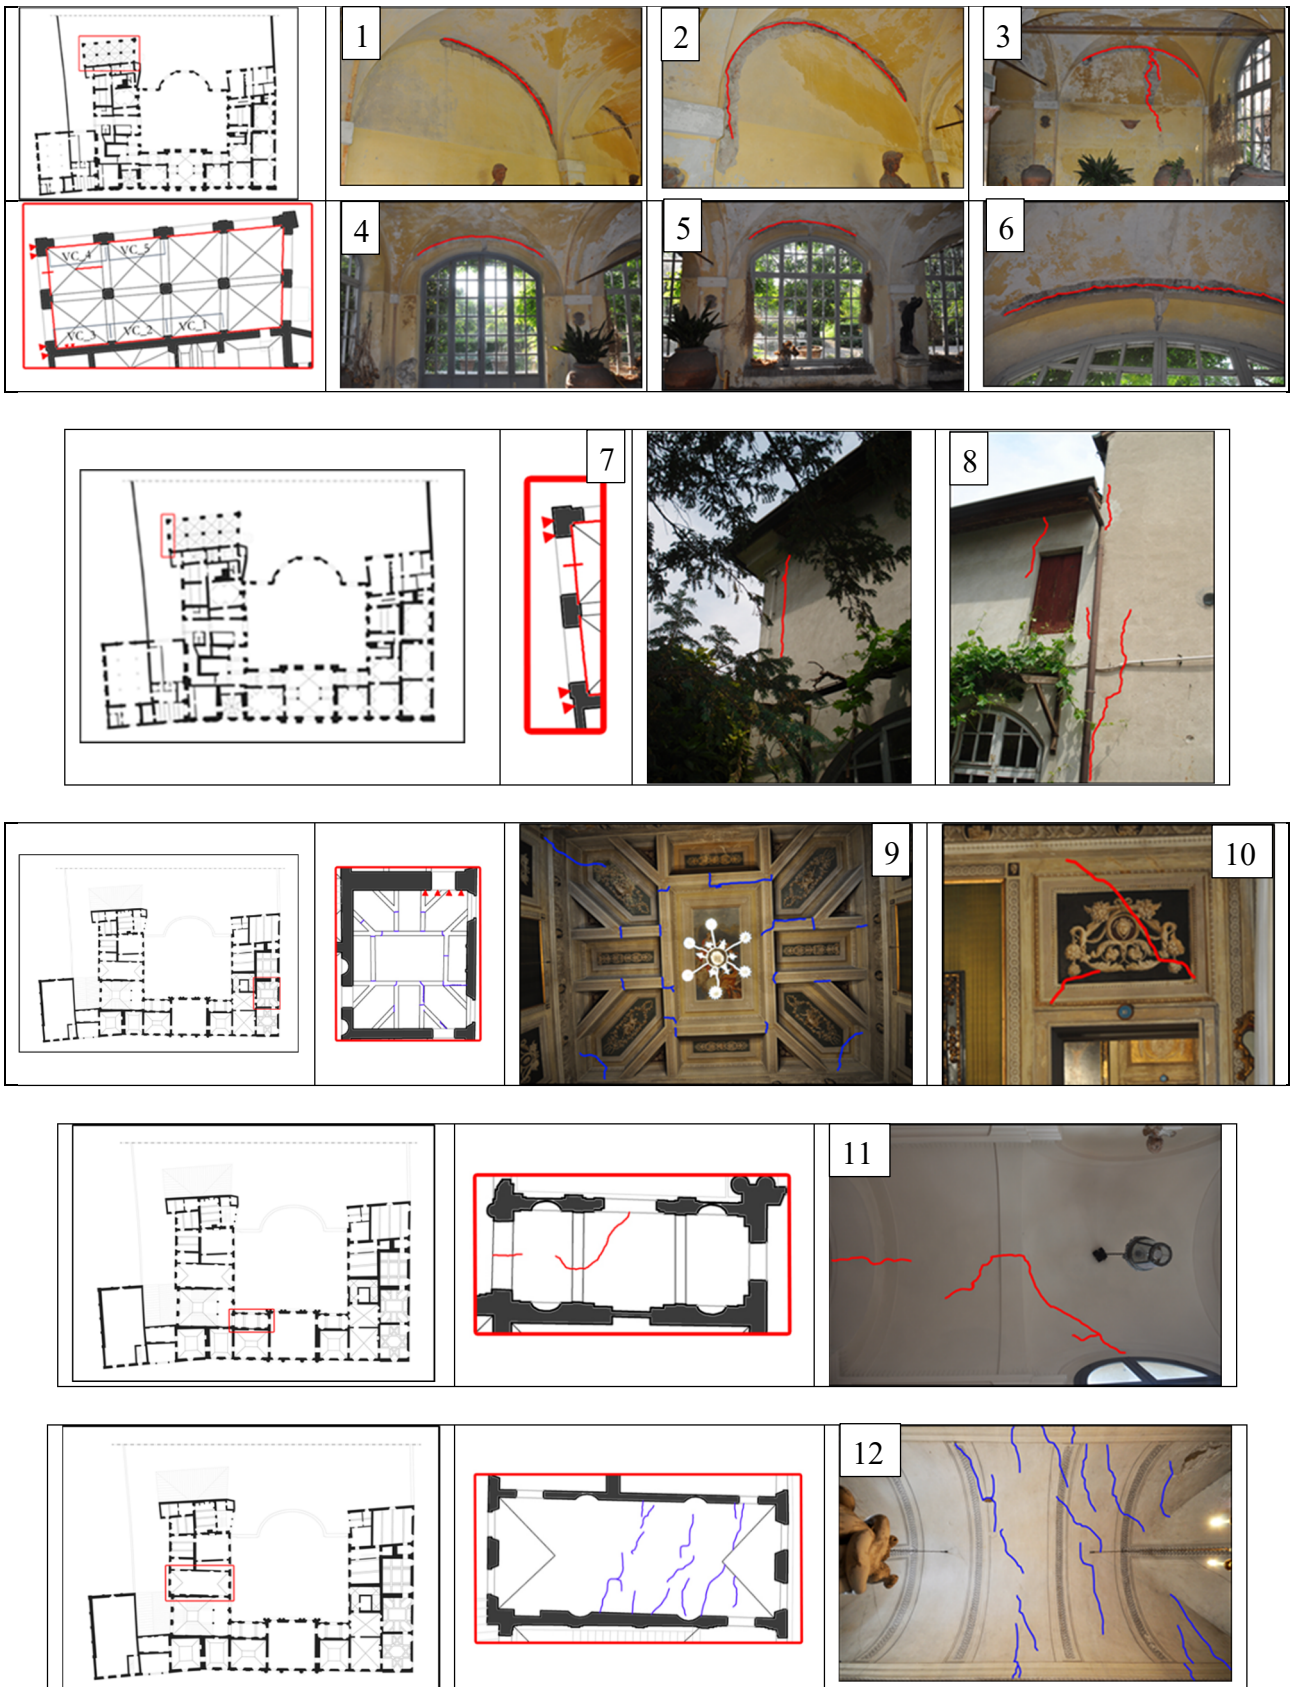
Palazzo d'Arco: photographic documentation of the crack patterns. 1-6. Vaults of the greenhouse, ground floor. 7-8. South-west wall of the greenhouse, external wall. 9-10. Wooden ceiling and lintel of the door, Green Room, first floor. 11. Vaults of the corridor, first floor. 12. Vault of the library, first floor.
